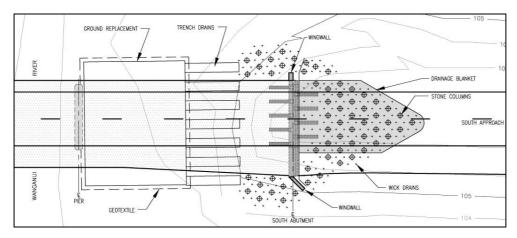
Layout of stone column ground improvement at south abutment of Cobham Bridge
